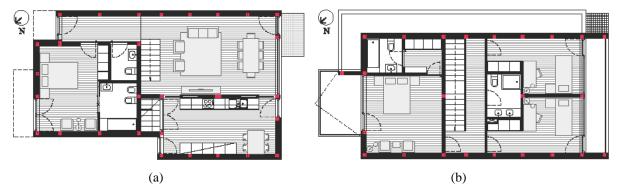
Architectural blueprints of the case study building: (a) ground floor; (b) first floor levels
